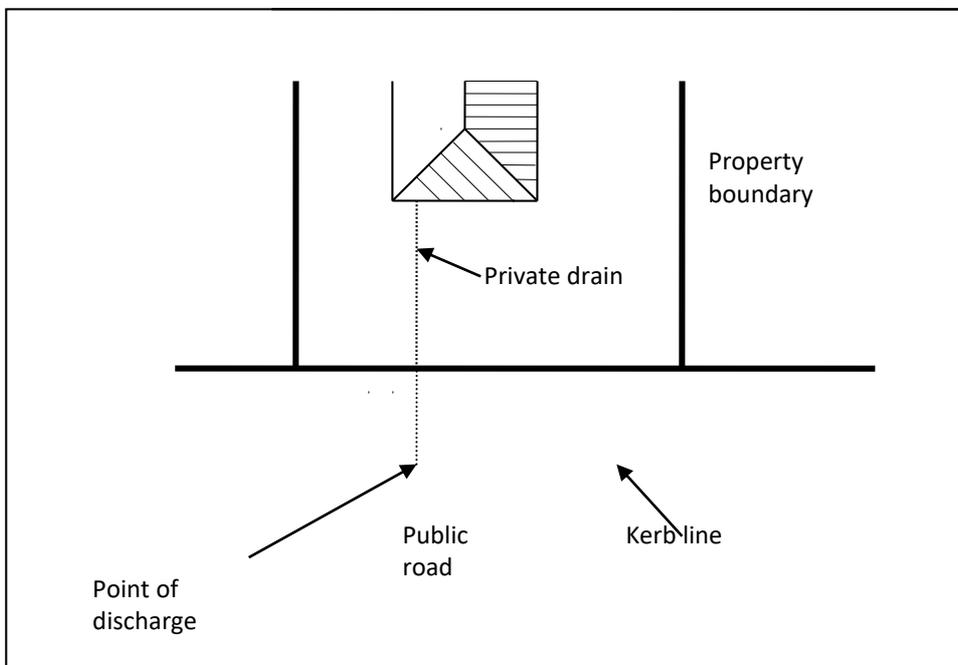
Point of Discharge Location - With Street Frontage To Kerb
